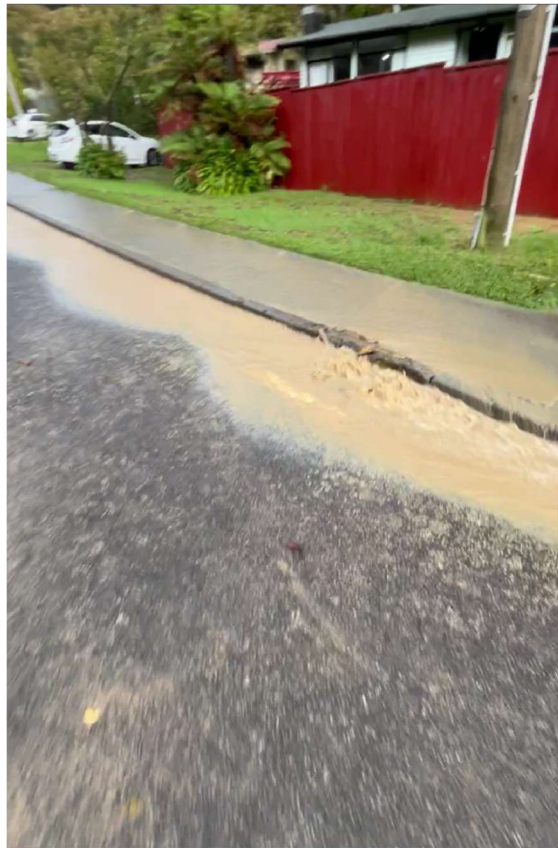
18-4-26 9:58am View south up Pinehaven Rd – full carriageway and berms flooded
